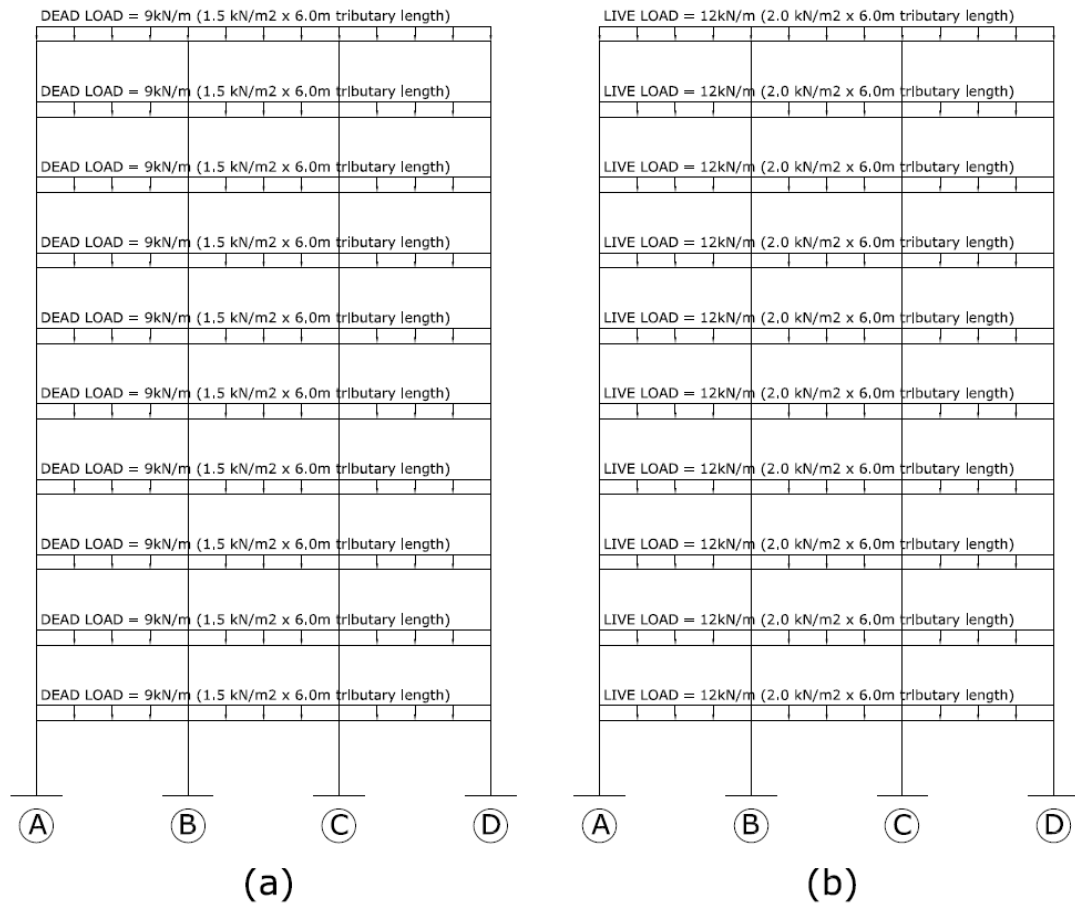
Design loads for ten-storey building (a) dead loads (b) live loads
